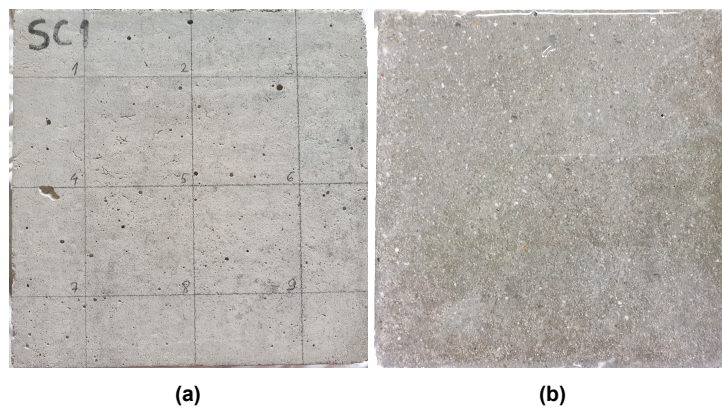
(a) Concrete surface, (b) Sanded concrete surface
